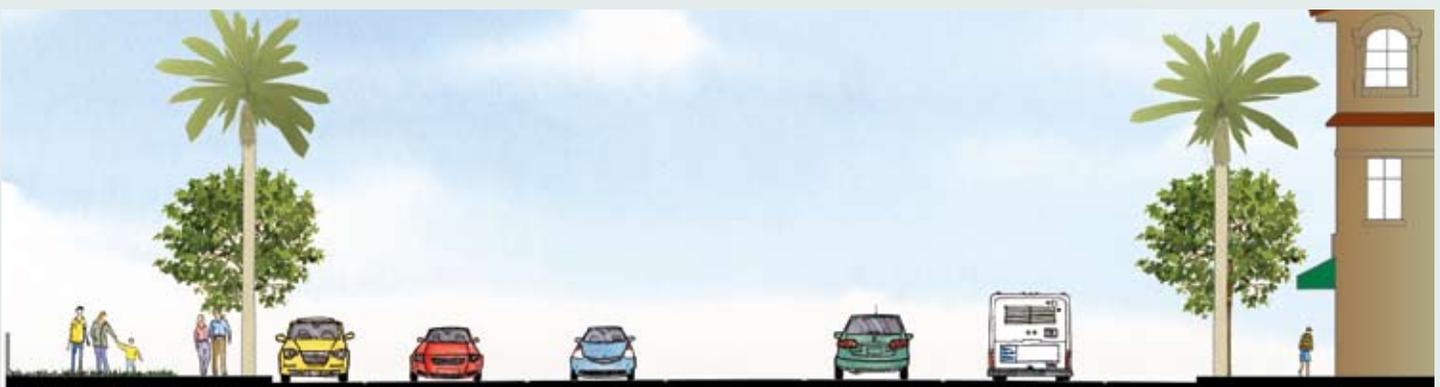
Cross section of Pacific Coast Highway from 1st Street to 9th Street
